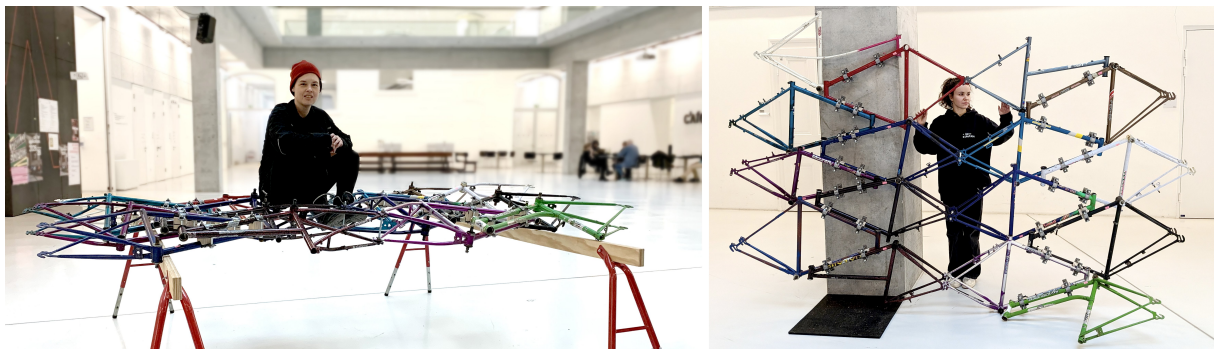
Load bearing assessment of horizontal flat assembly (left), same assembly in vertical position (right)
